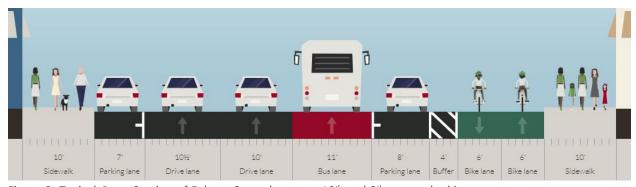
Typical Cross Section of Folsom Street between 10th and 8th streets, looking east
